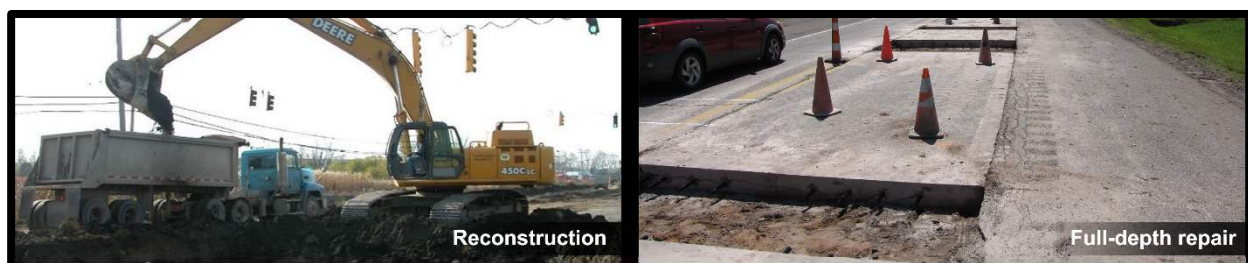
Examples of reconstruction treatments—(left) reconstructing a road and (right) road prepared for full-depth repair.
